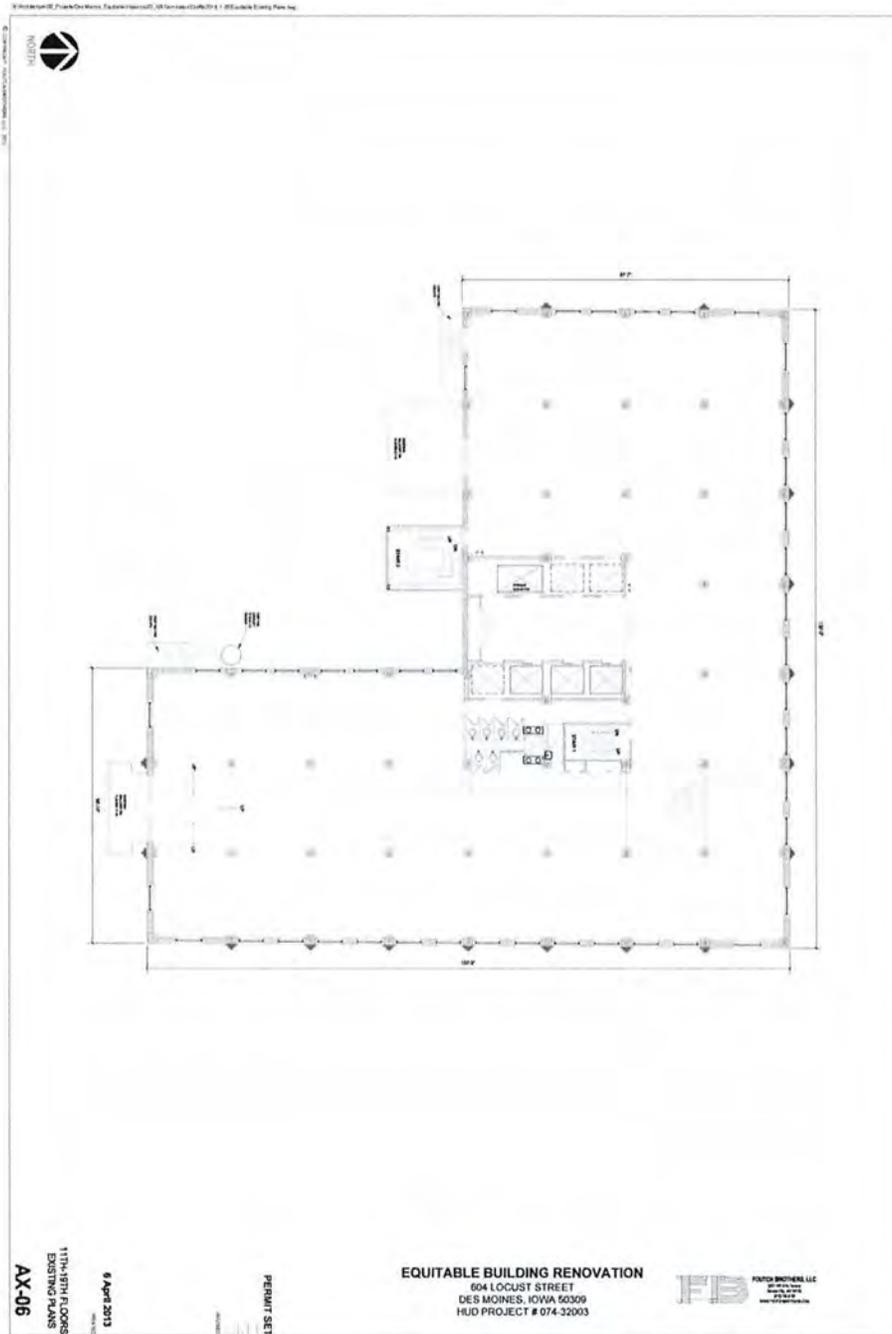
Typical 11th-19th Floors Existing Plans, drawn by Fouch Brothers, LLC from field measurements. Interior partition walls vary from floor to floor, refer to building description for more detail
